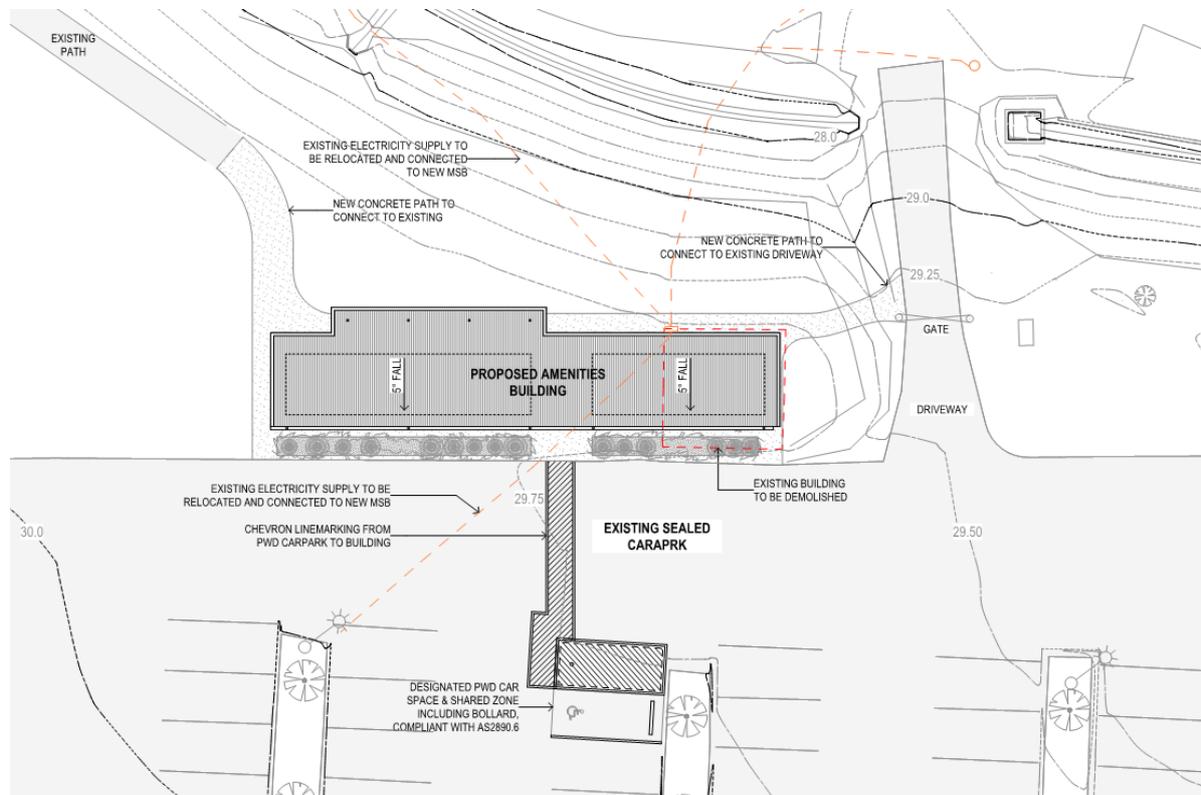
Indicative Building and Disabled Carpark Location Plan
